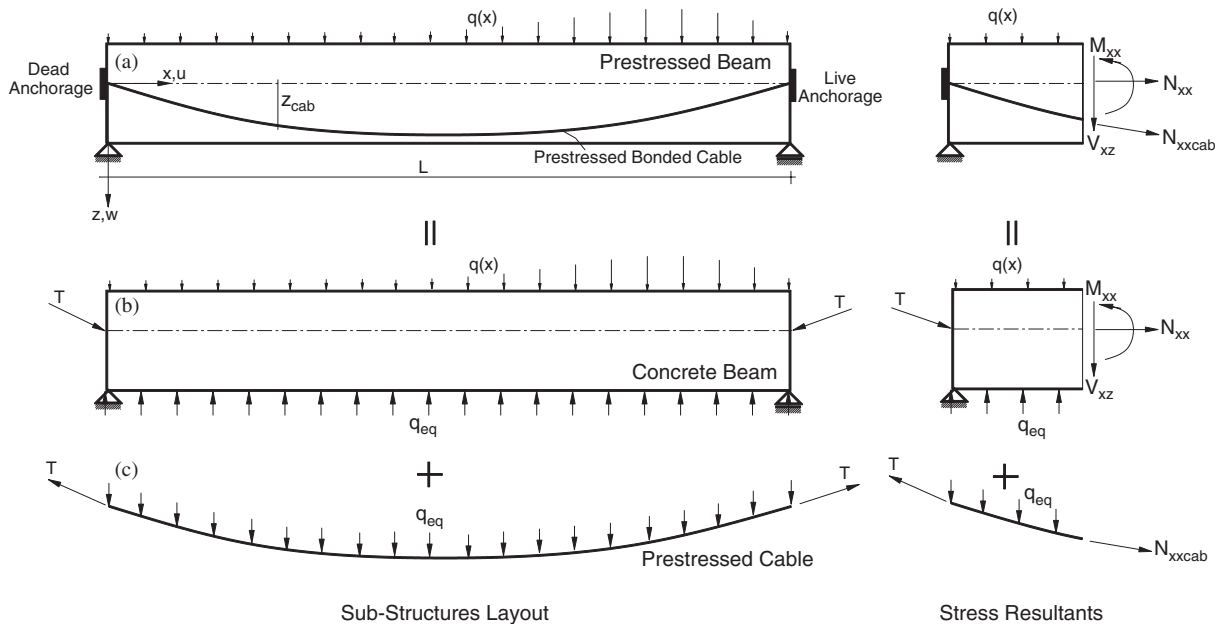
Substructure layout and internal stress resultants of a typical prestressed beam: (a) prestressed beam; (b) concrete beam; and (c) tensioned cable.
